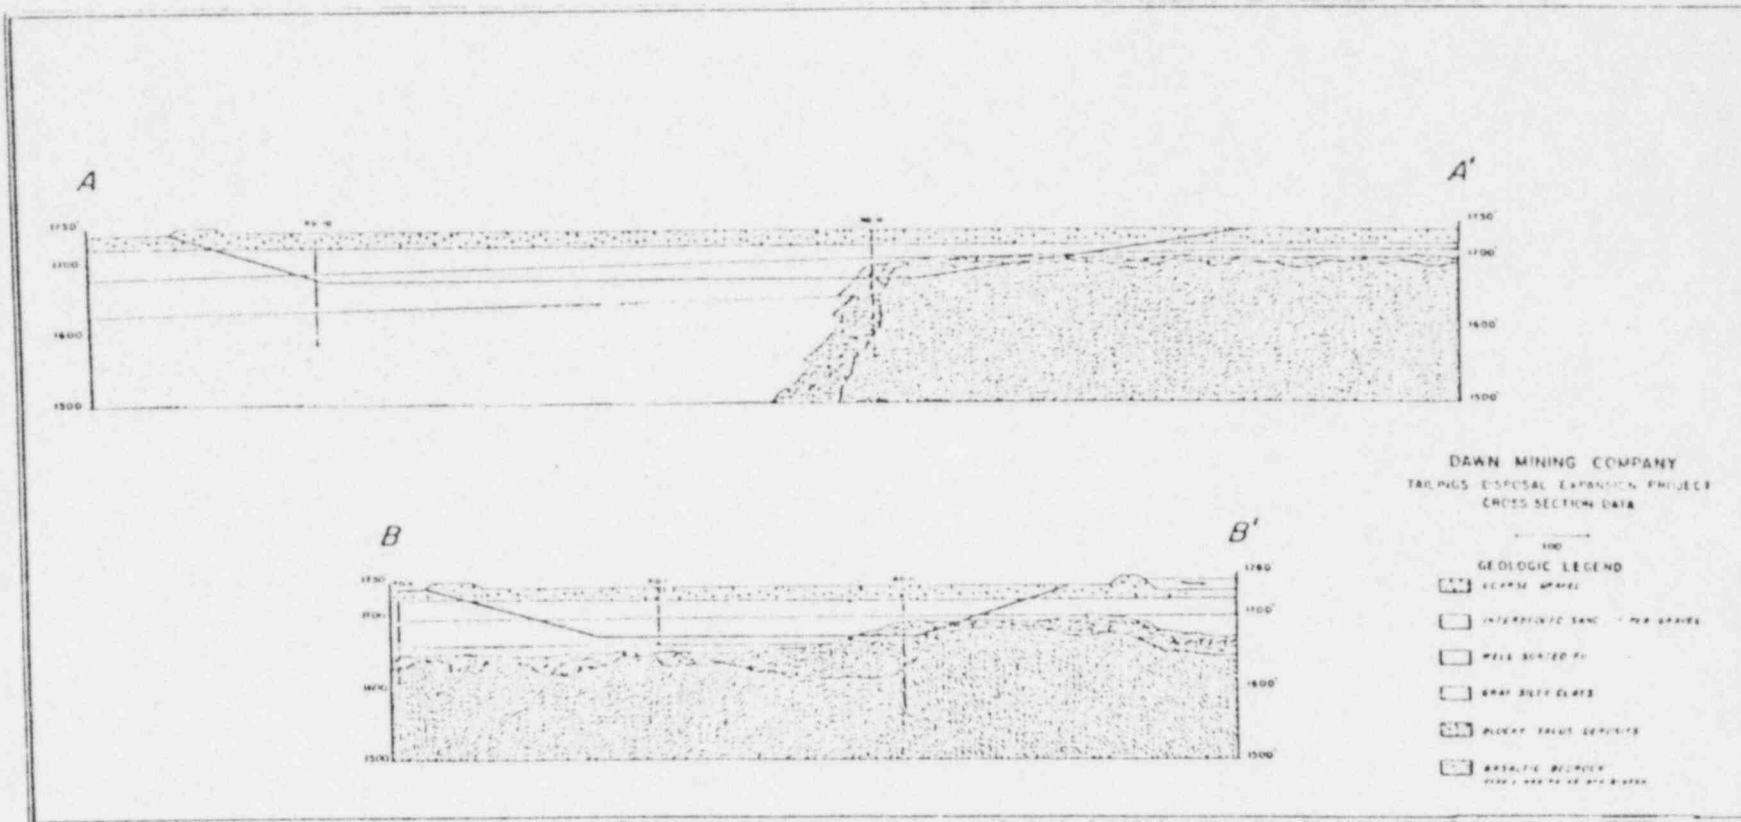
Cross-Sections of Proposed Pit (Source: Reference 1)
